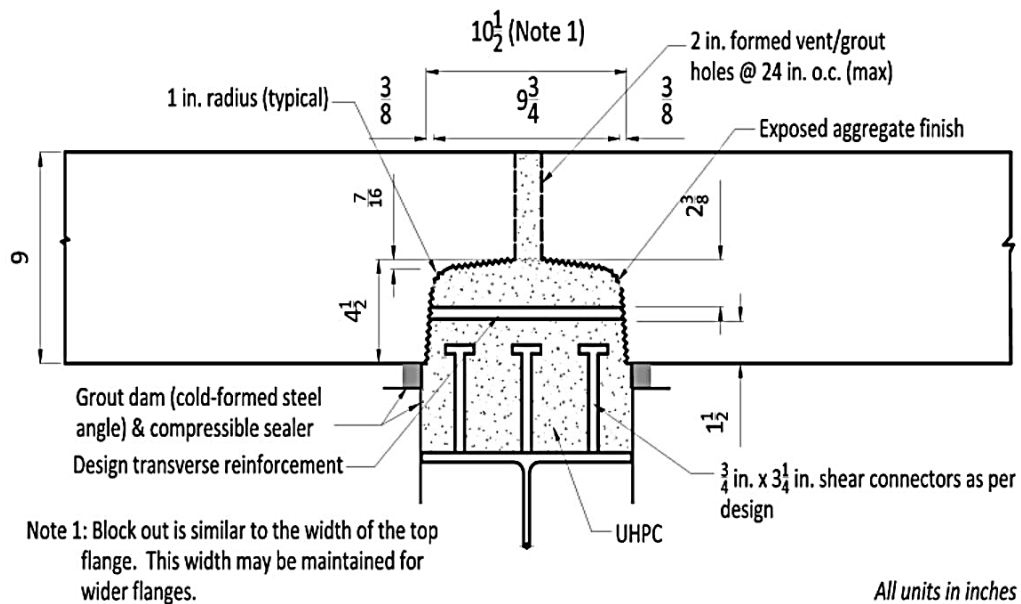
UHPC composite connection between deck panel and steel girder [57].
